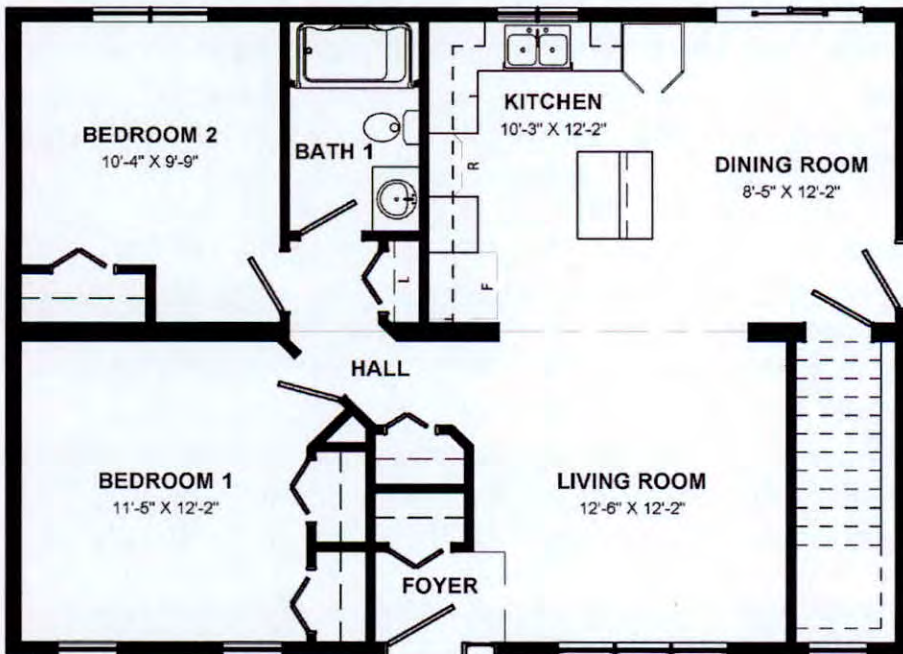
A typical floor plan of a multi-section home. Multi-section homes consist of two or more components, each with three walls attached to a roof and floor section, then are joined at the site. © Kent Homes (2019).
